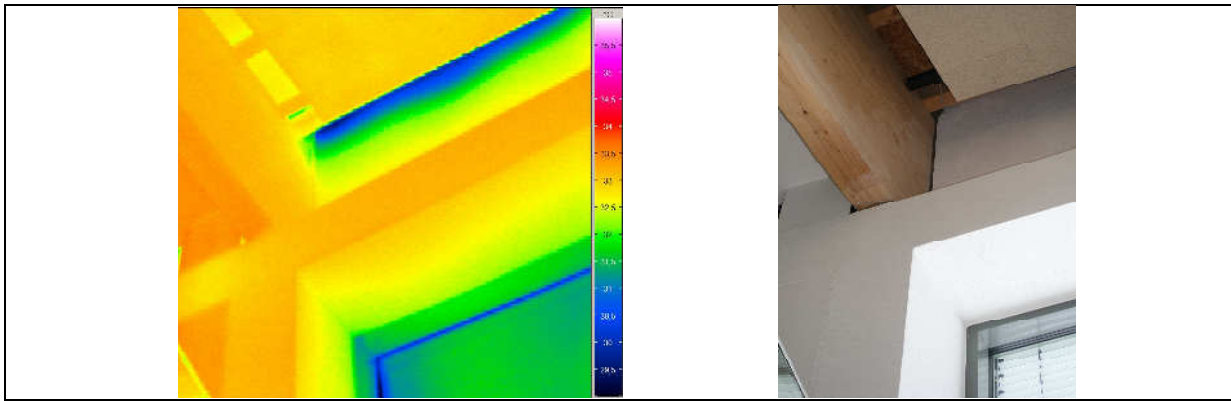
Area of the suspended ceiling / outer wall in the leisure hall
